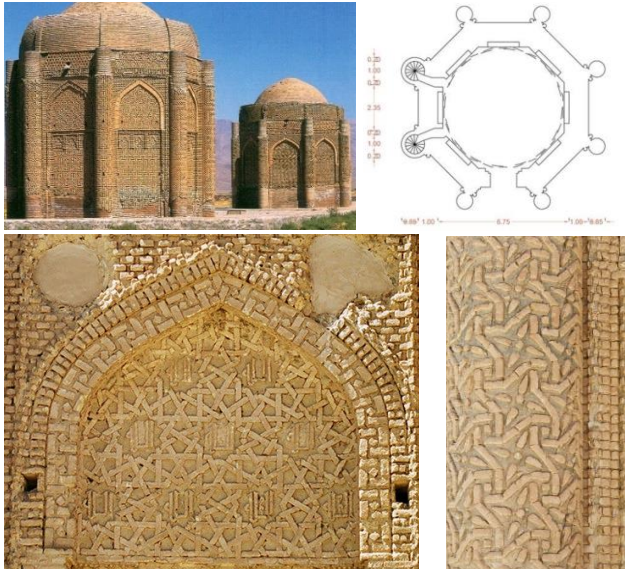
Kharāqan Towers detail shows developed Technology, with geometric patterns carved into brickwork, turning structure into an artistic medium through material poiesis (Photos: authors' archive).
